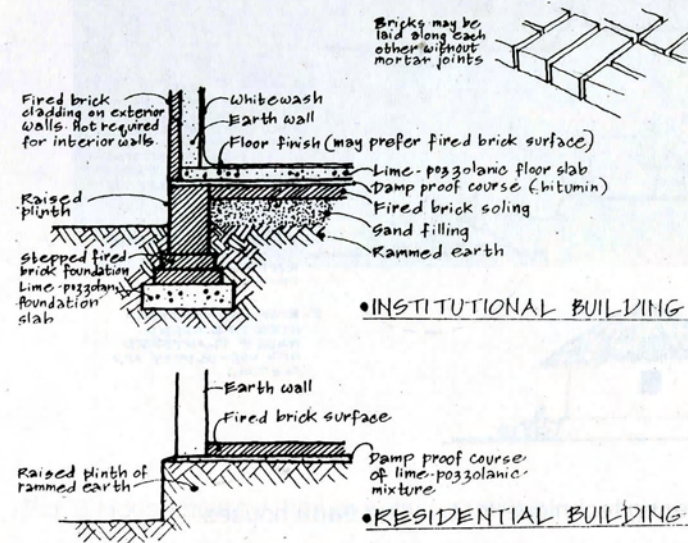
Some proposed methods of damp-proofing floors of earth building.
